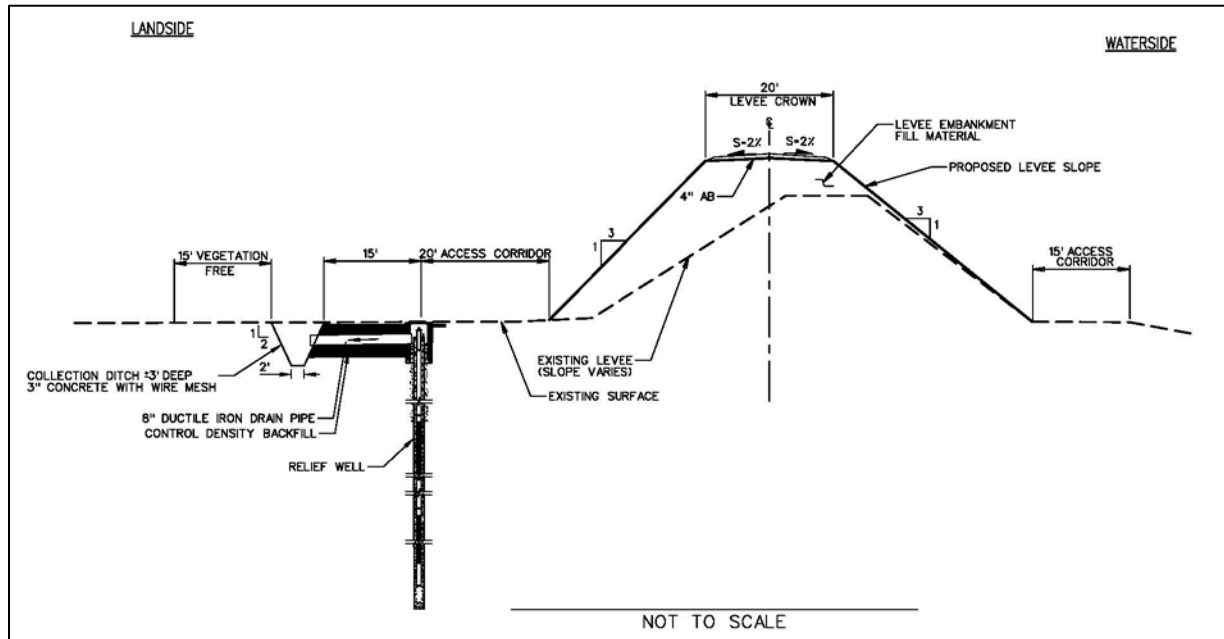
Fix in Place Levee Improvement with Relief Well.
